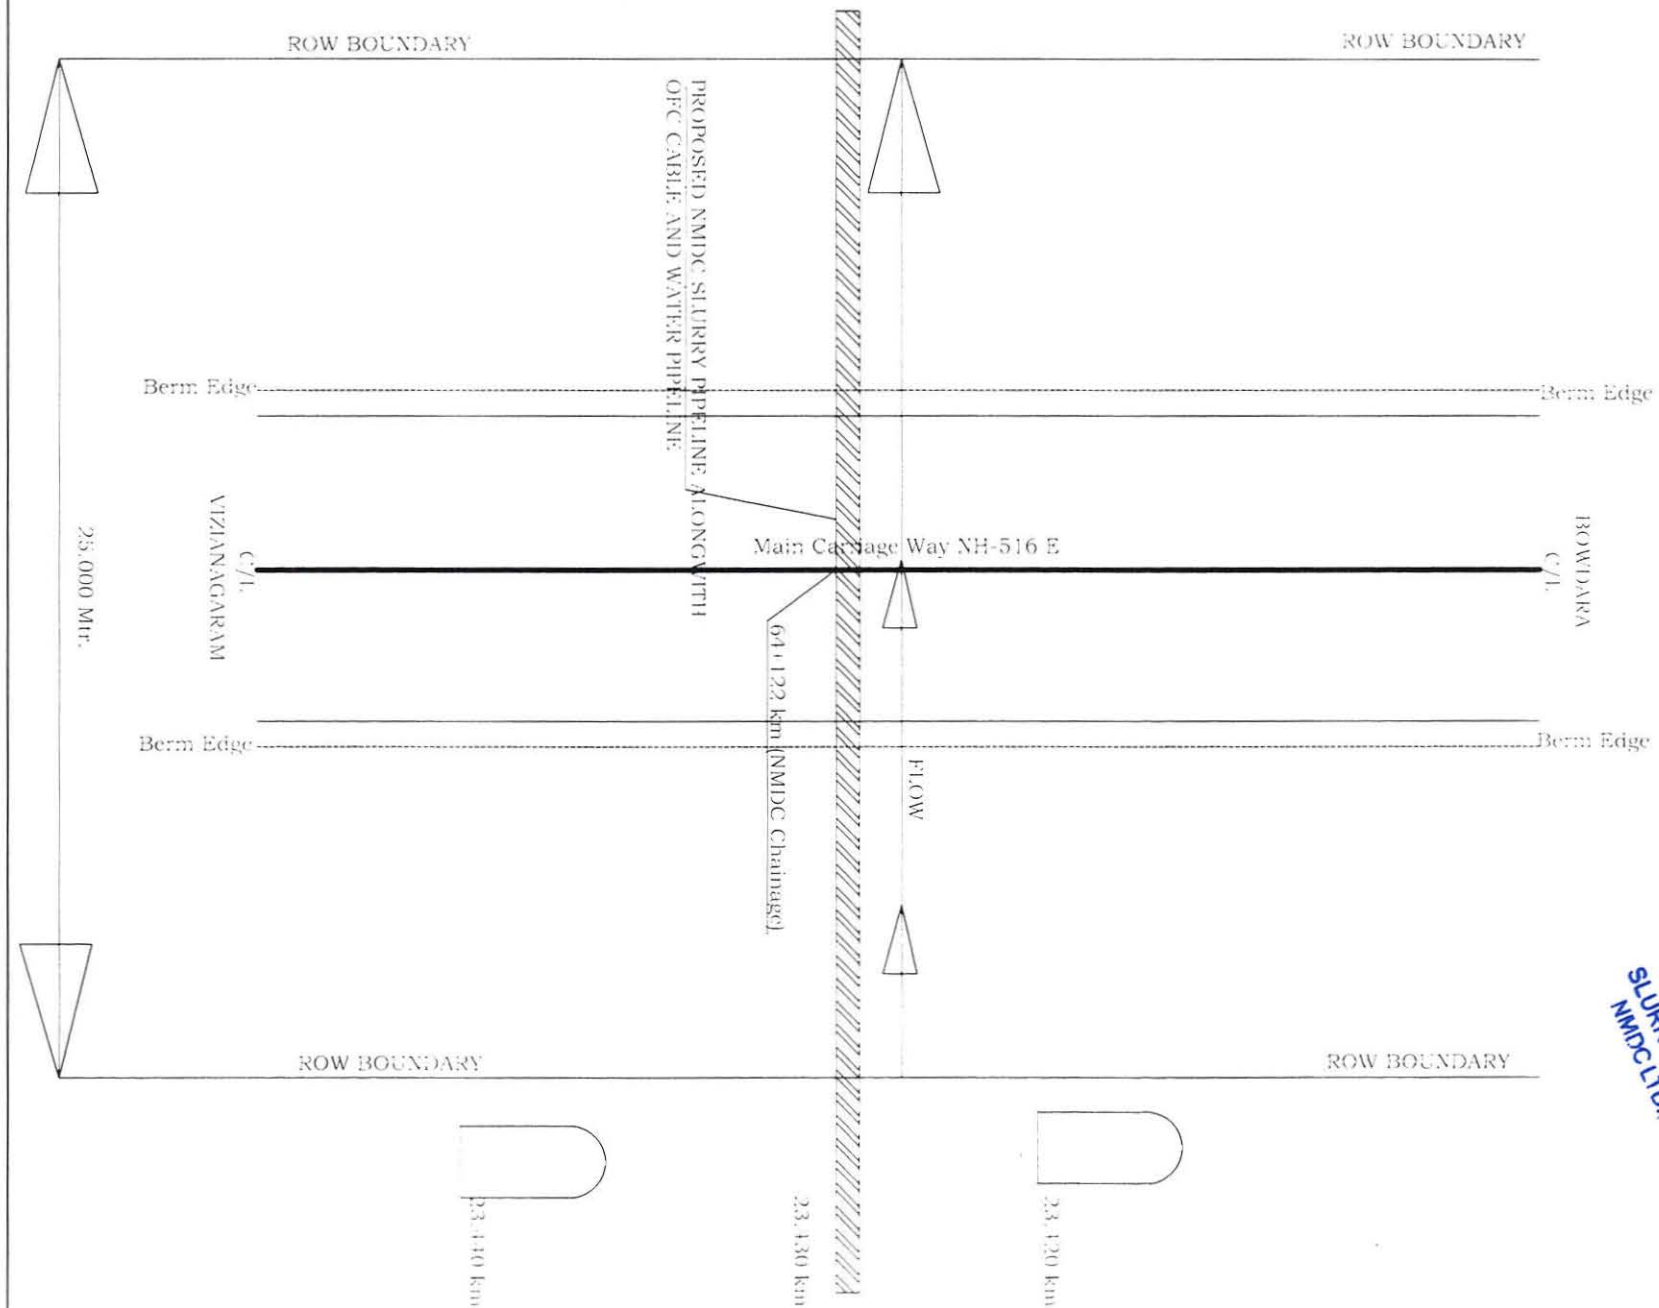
INSTALLATION OF CASING PIPE FOR CROSSING THE ROAD
